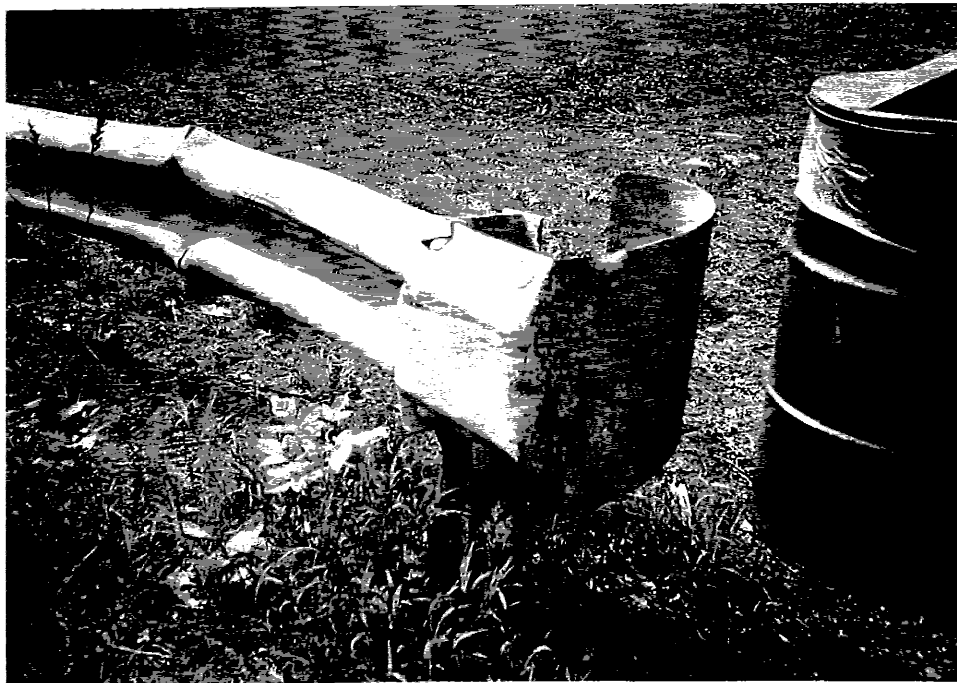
The damaged westernmost rail of the west approach guardrail. Note the rust stains of the rail and post.
